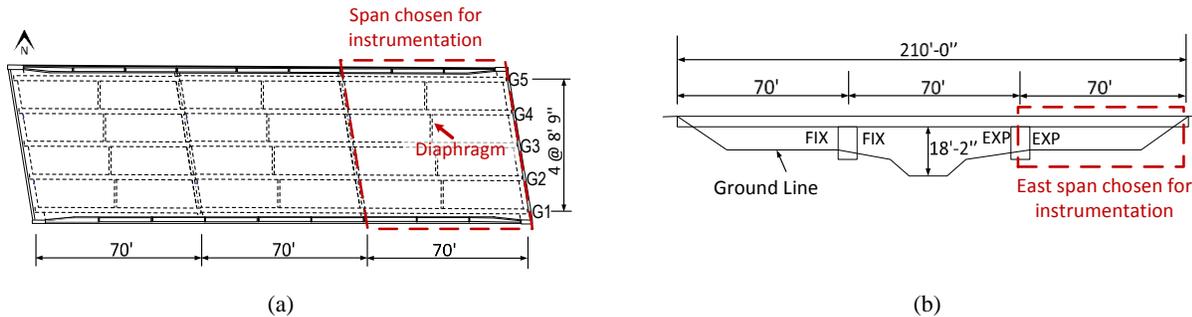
SR113 bridge over Dry Creek: (a) plan view, (b) elevation view
